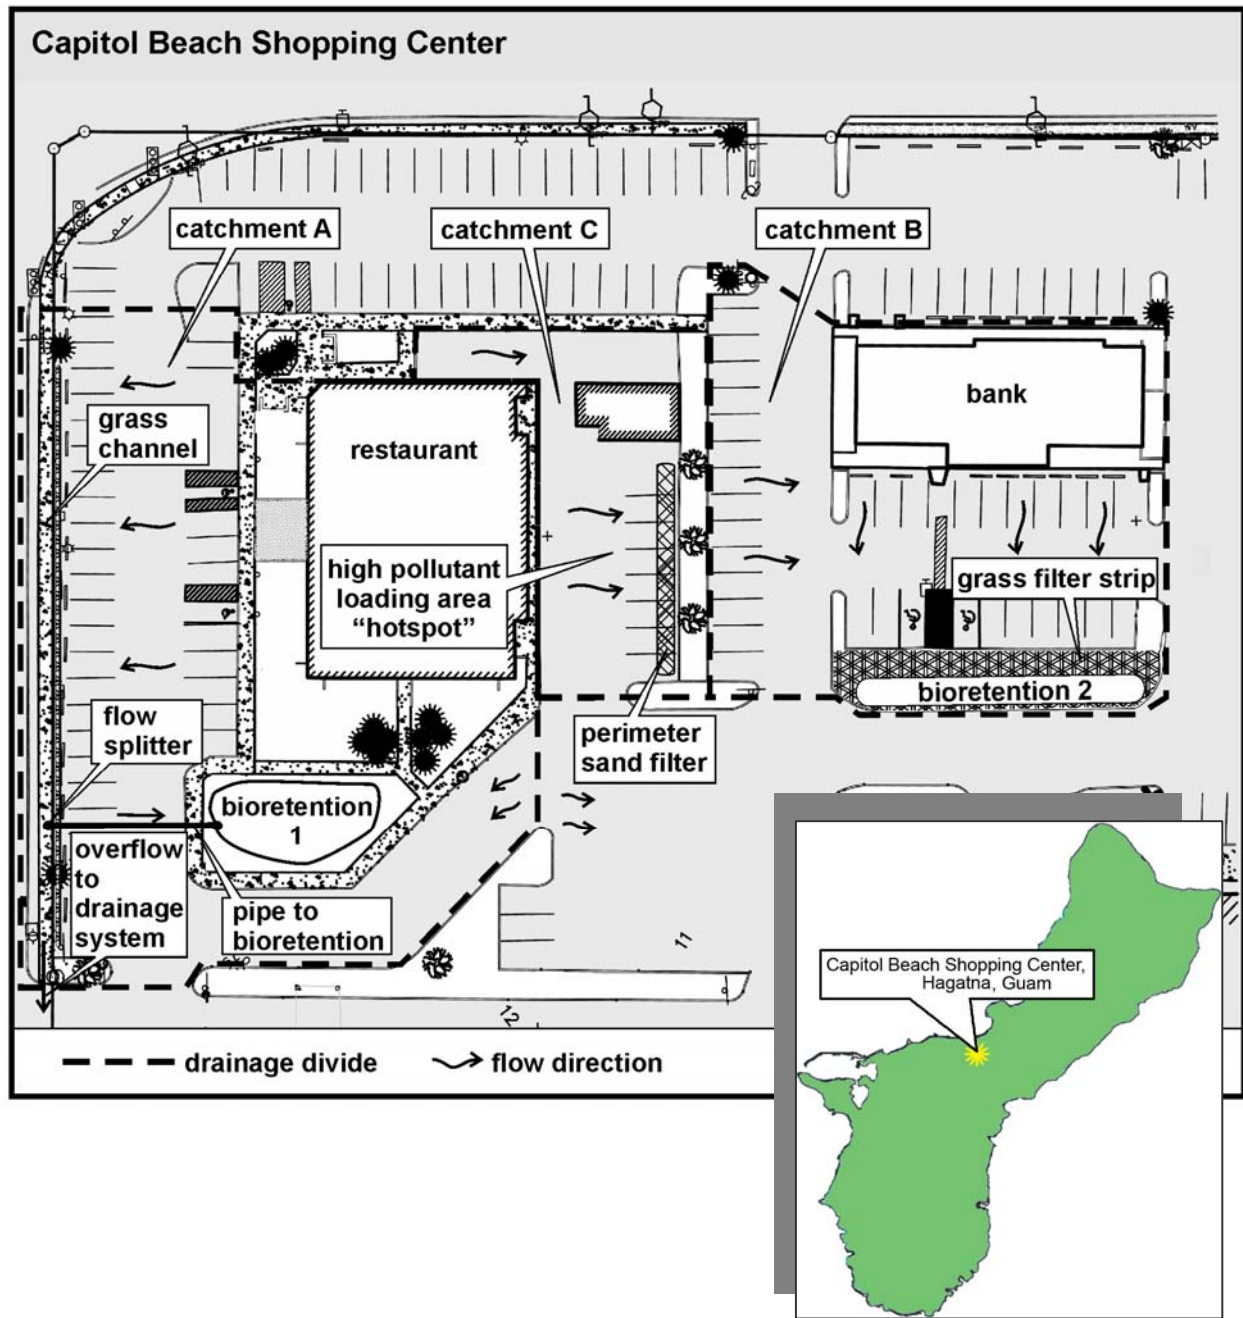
Capitol Beach Shopping Center - Commercial Site Plan on Guam
